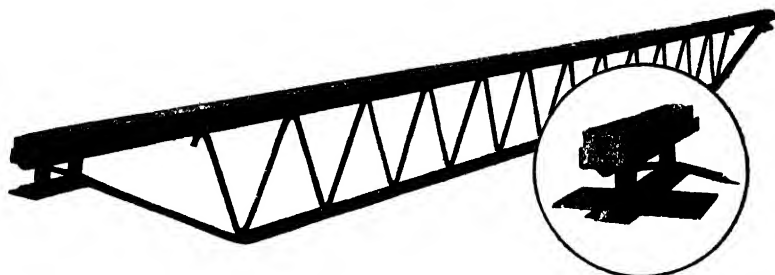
Illustrating typical open truss steel joists and end detail with bearing plate for bolted connection
